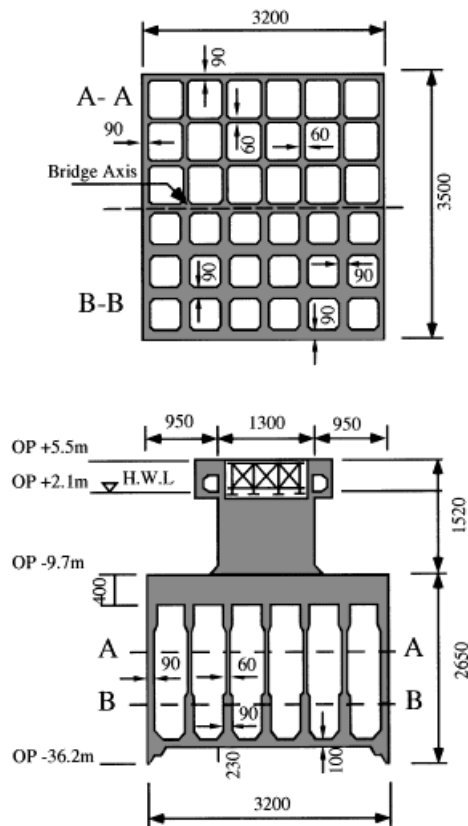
Horizontal and vertical cross-sections of the foundation at P24 (dimensions in cm)
